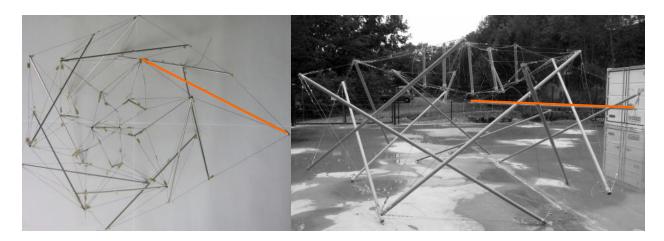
Model Scale 1:100 Plan View (left) – Model Scale 1:10 Elevation View (right).
